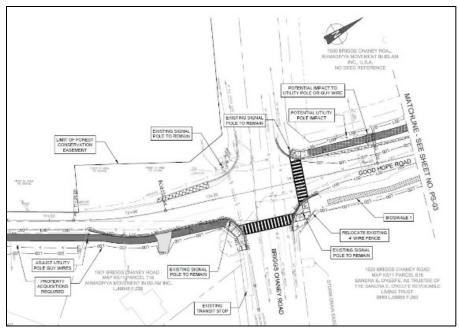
Proposed Intersection Improvement – Good Hope Road at Briggs Chaney Road
